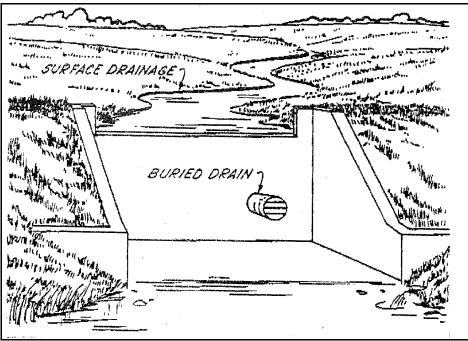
Drain outlet protection when surface water is present (Source: NRCS National Engineering Handbook)
